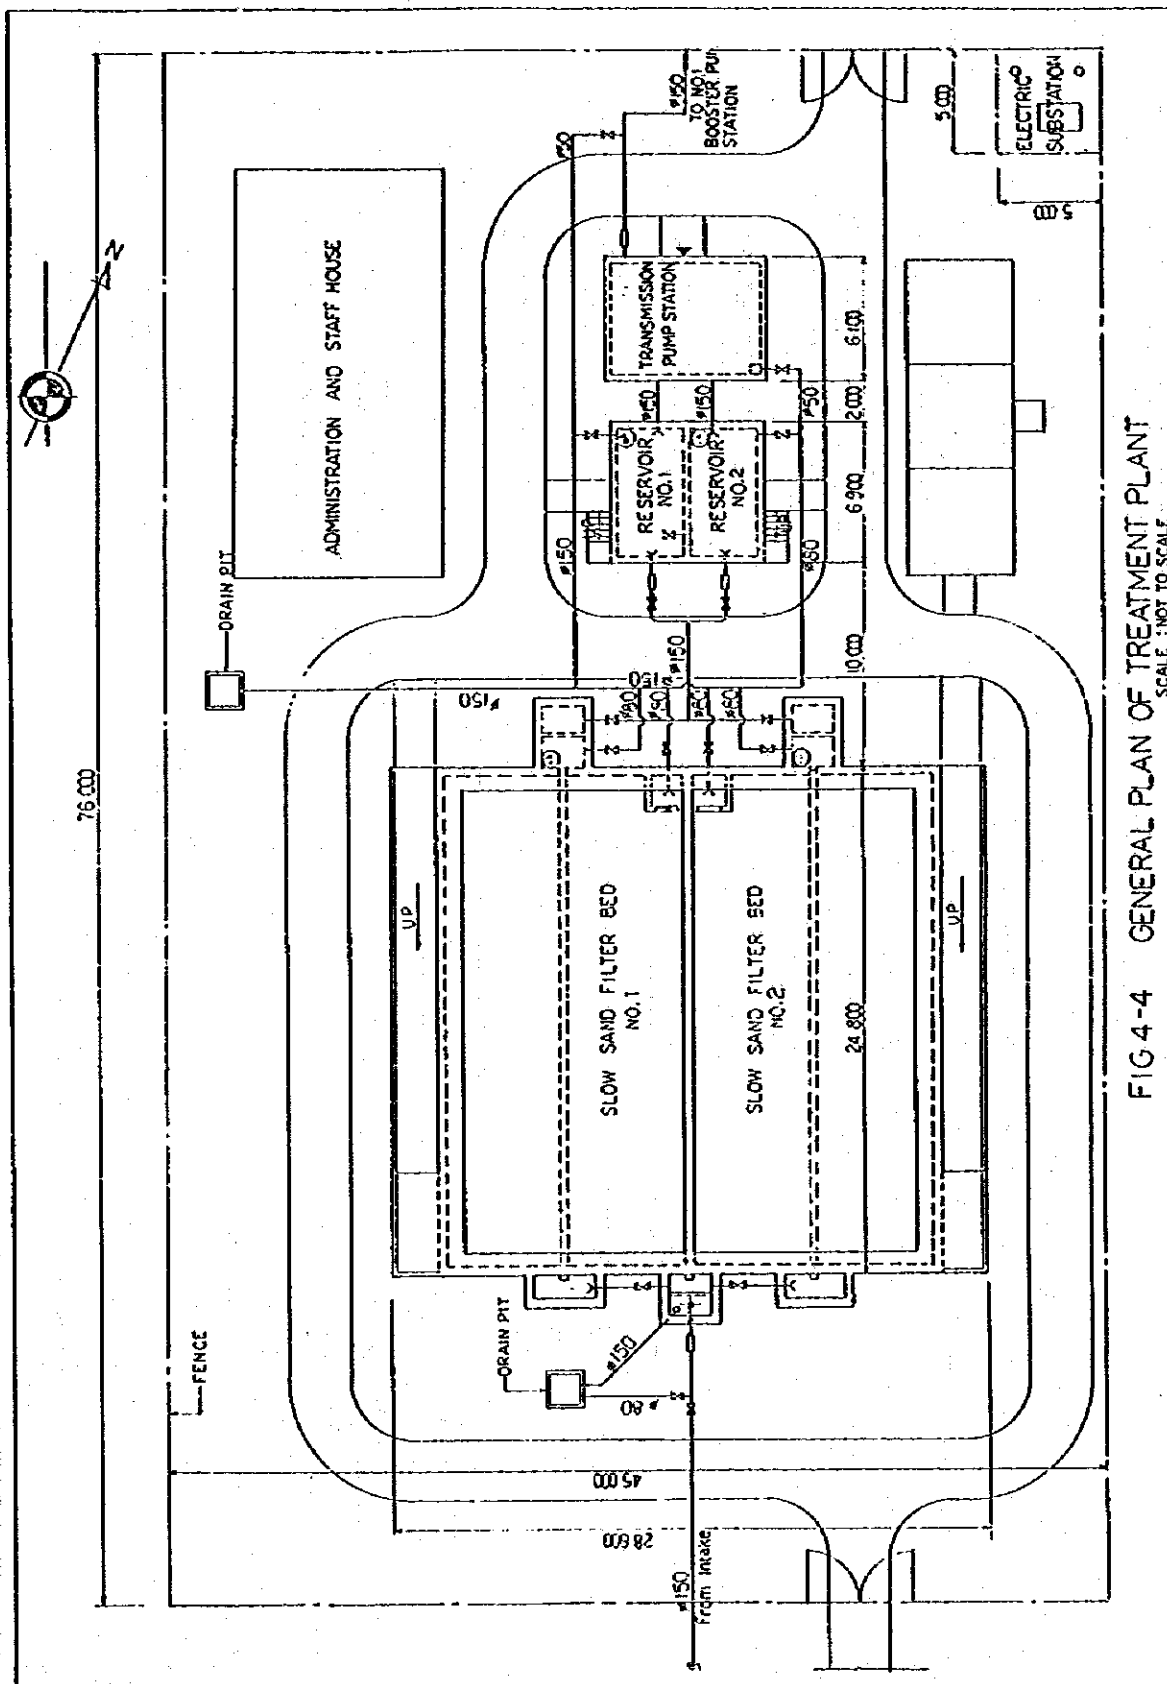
GENERAL PLAN OF TREATMENT PLANT
